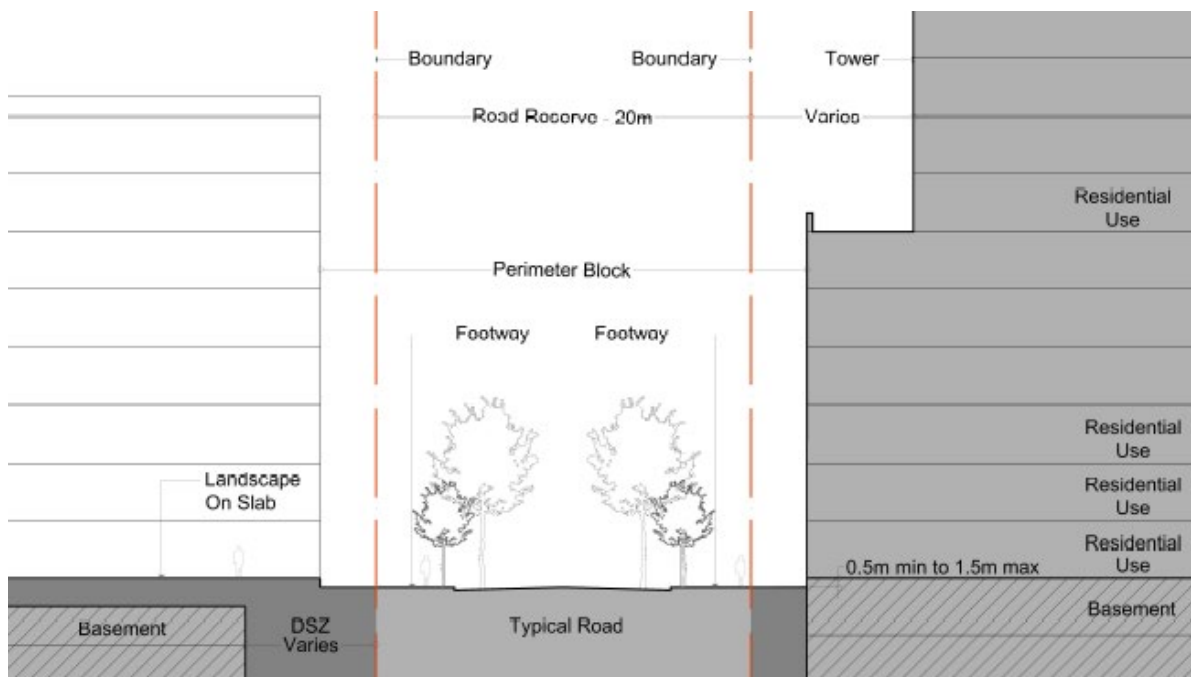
Courtyard Basement – Interface with Street
